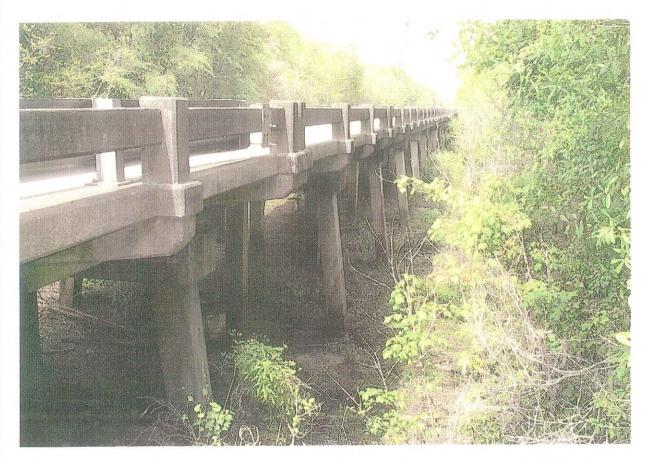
View of existing PeeDee Overflow Bridge from near south abutment. At time of visit area beneath bridge structure was almost entirely dry.
